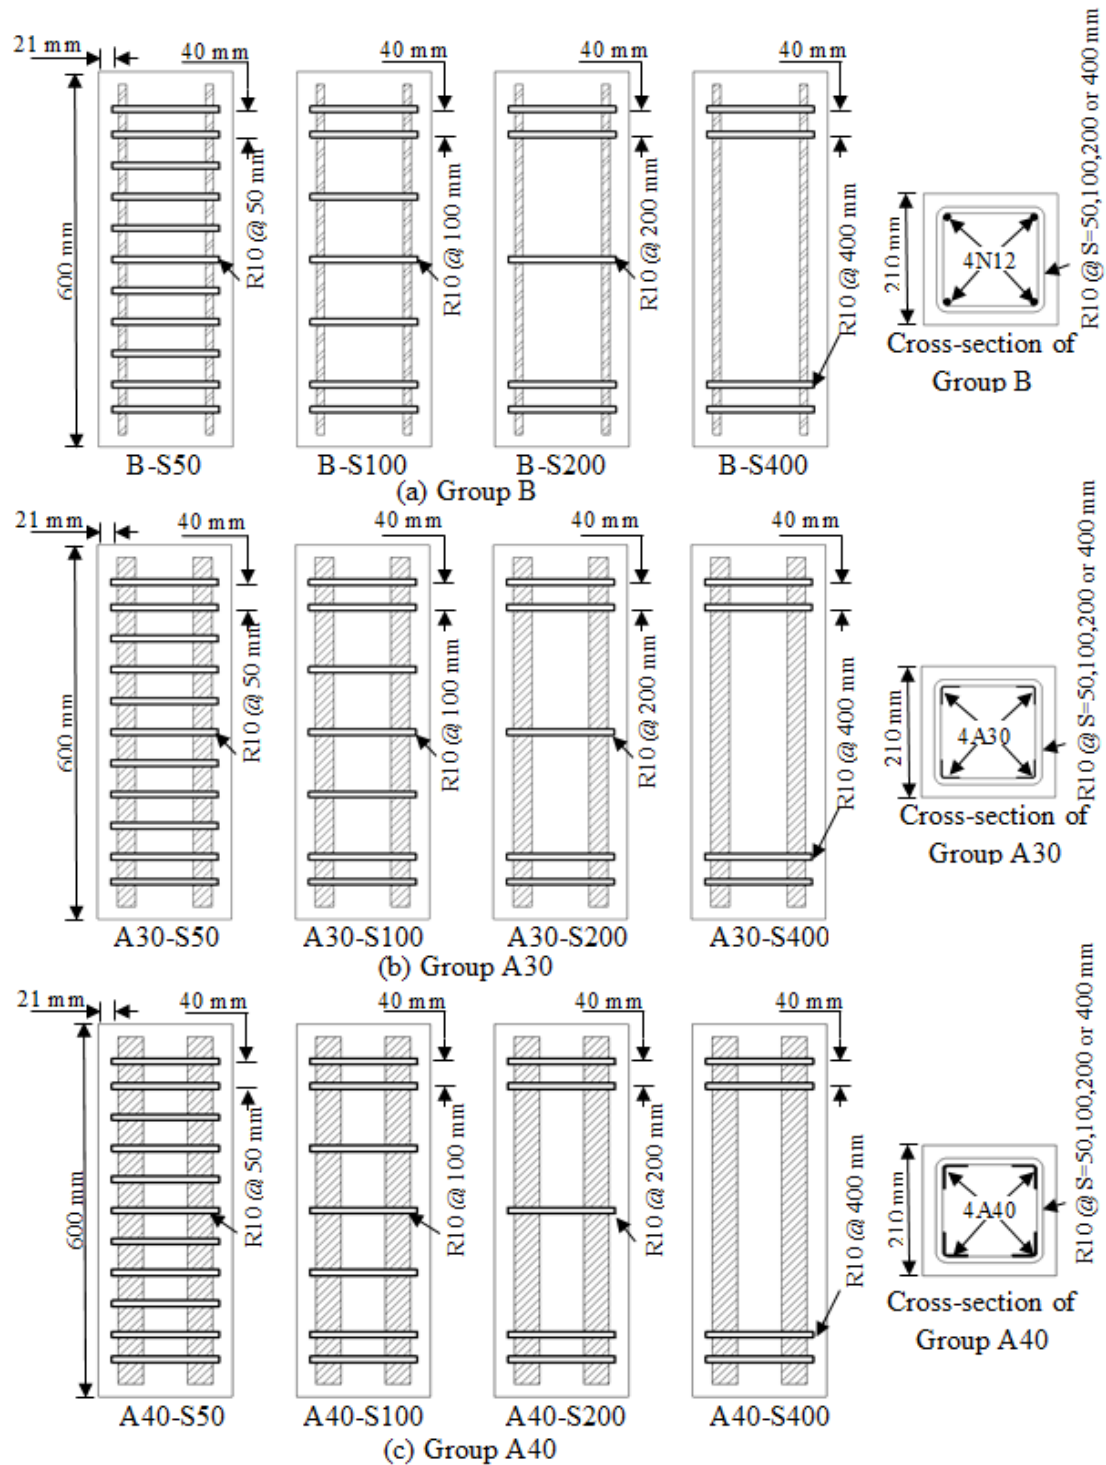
Geometry and reinforcement details of the tested specimens with 600 mm height
